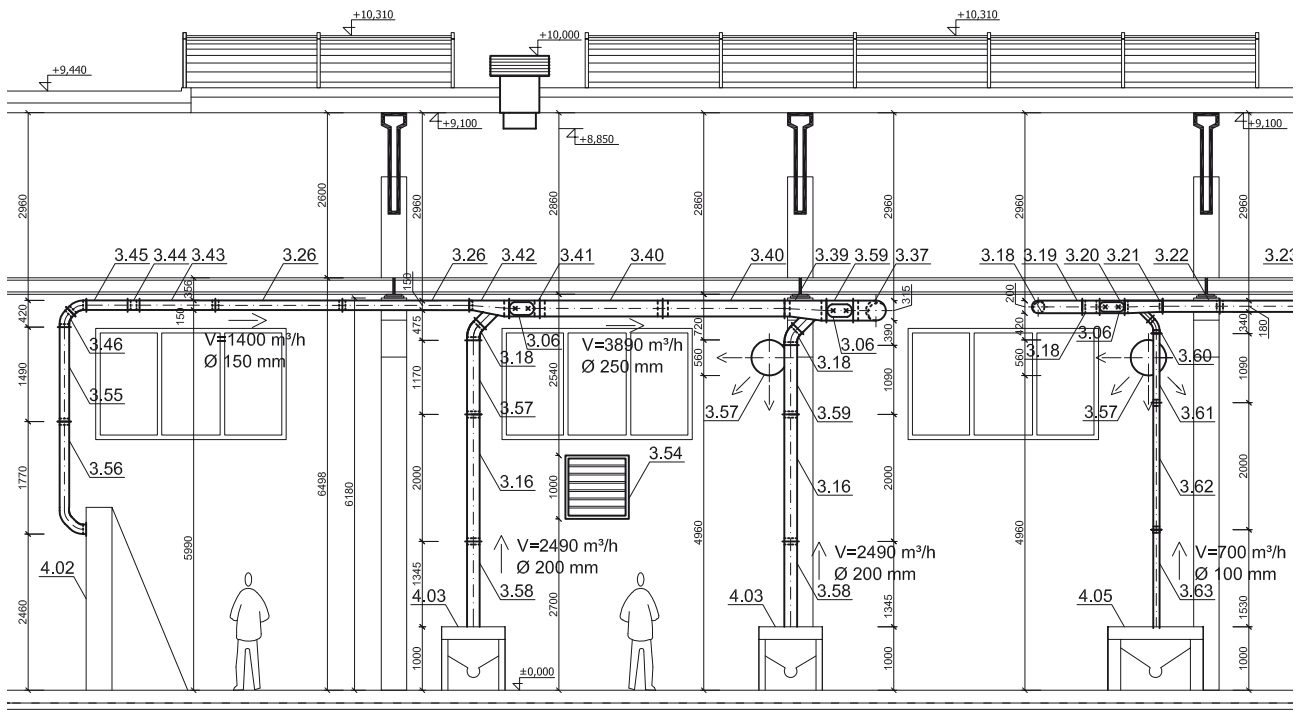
Local exhaust equipment – Cross section of wood industrial facility hall. [13]
